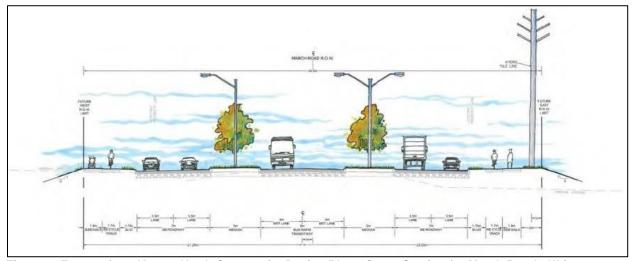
Excerpt from Kanata North Community Design Plan - Cross Section for March Road - Ultimate.
